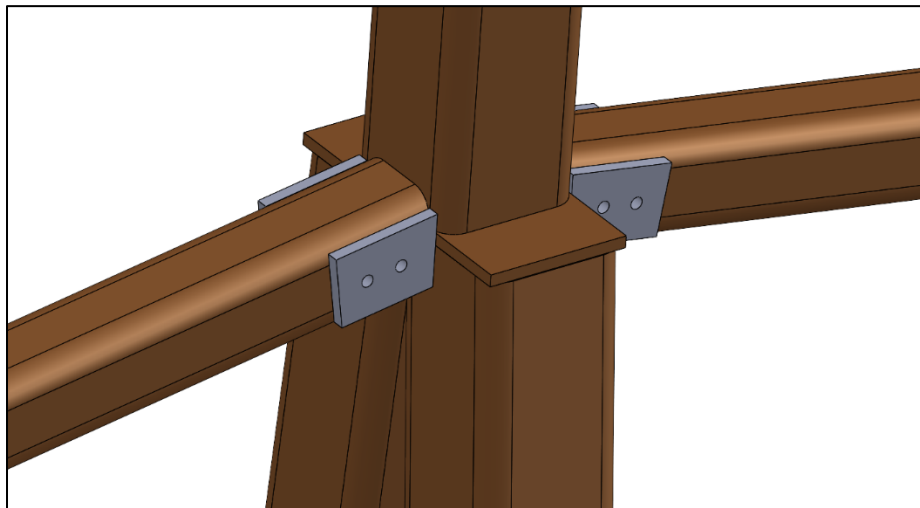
Outer Ring Bolted Connection from Full Assembly
